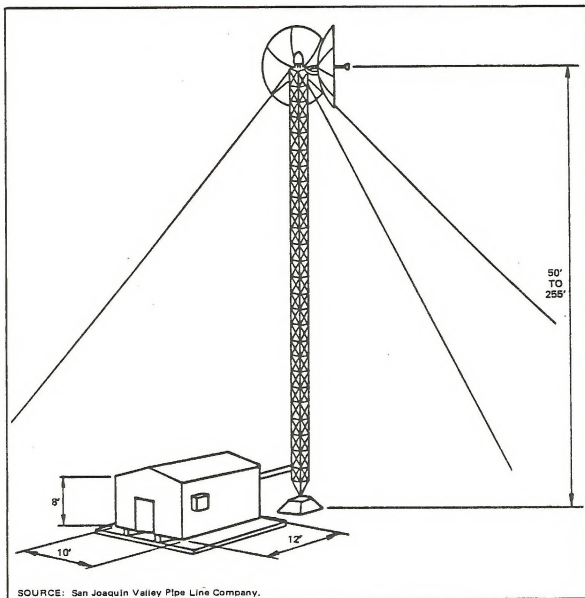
LAYOUT OF TYPICAL BOOSTER STATION
